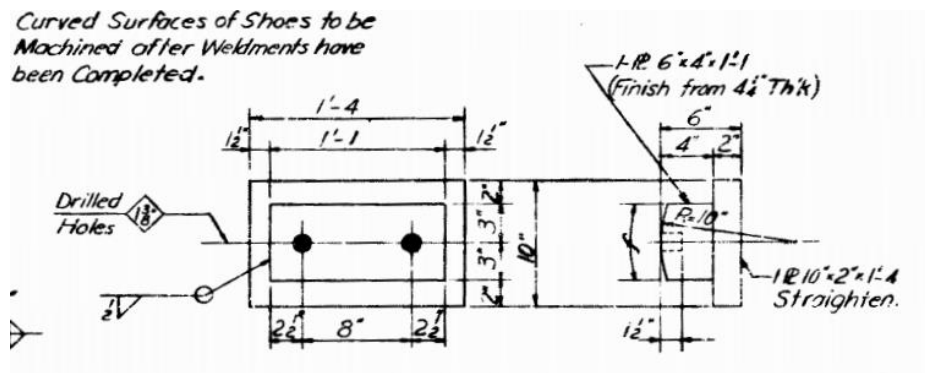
Fixed Bearing Assembly at Pier 2 for Structure I64-07-02367 BEBL (NBI 33280) (INDOT, 1964)
